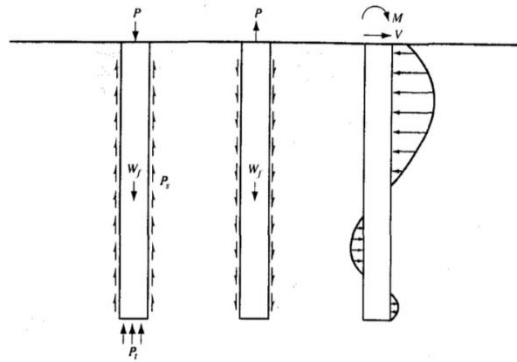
Load Transfer Mechanism: 1) Compressive Loads; 2) Tensile Loads; 3) Lateral Loads (Coduto, 2014)
